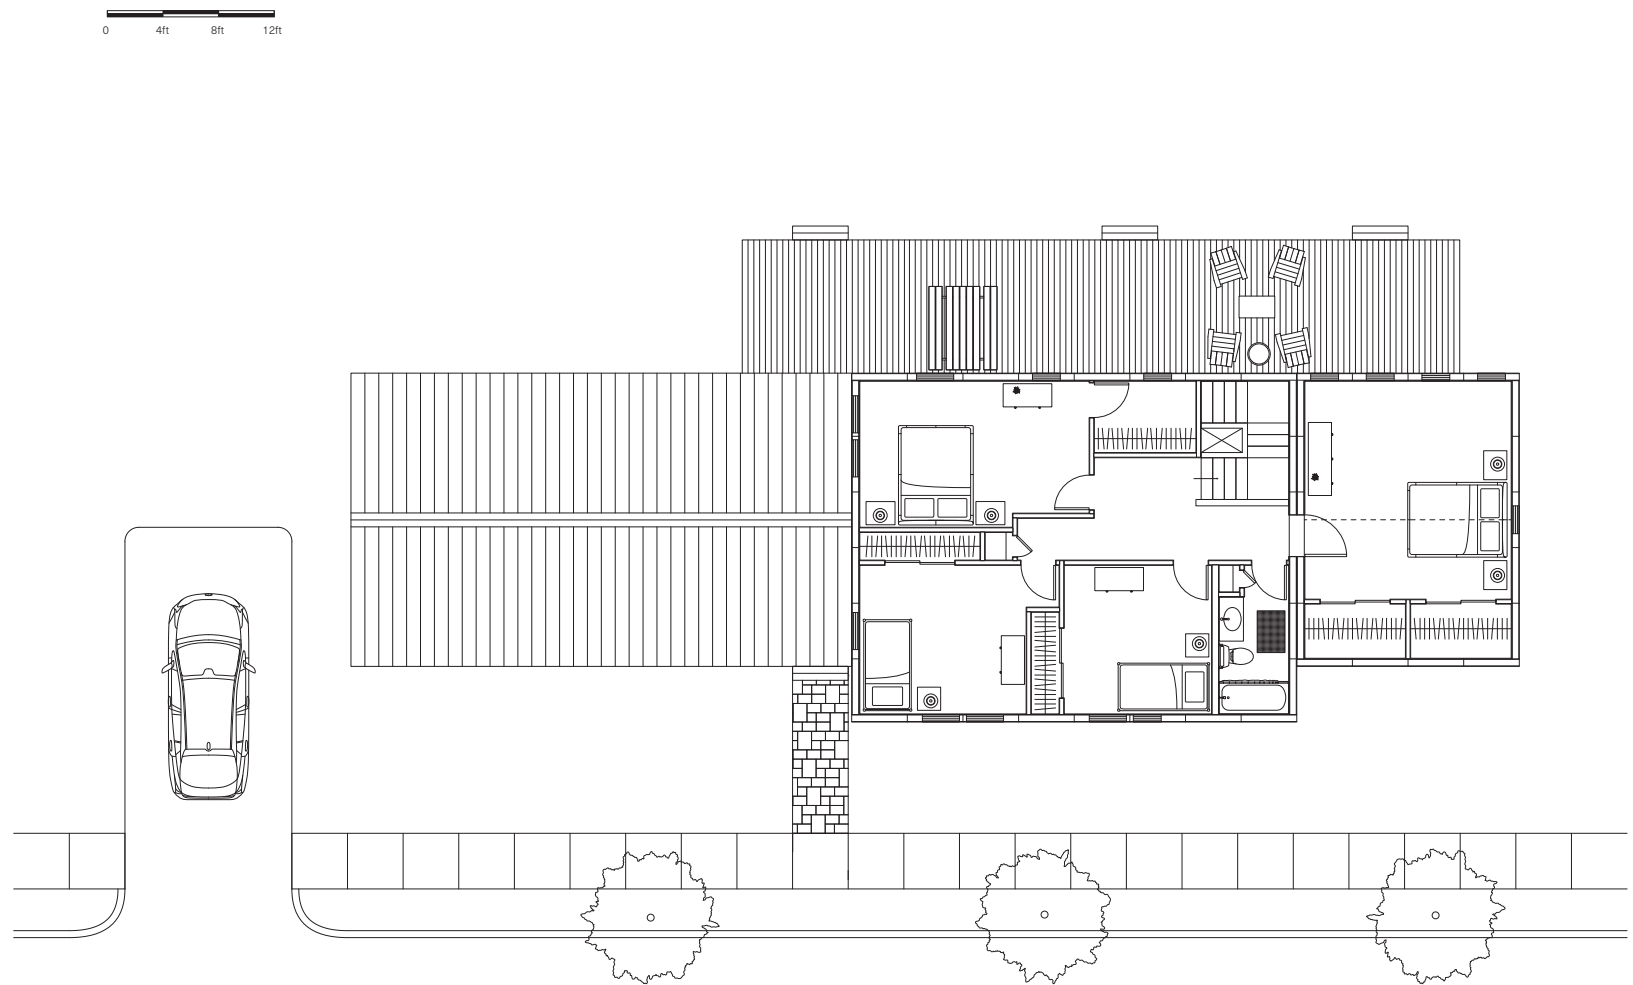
The Wing, Second Floor Plan, Fully Developed
